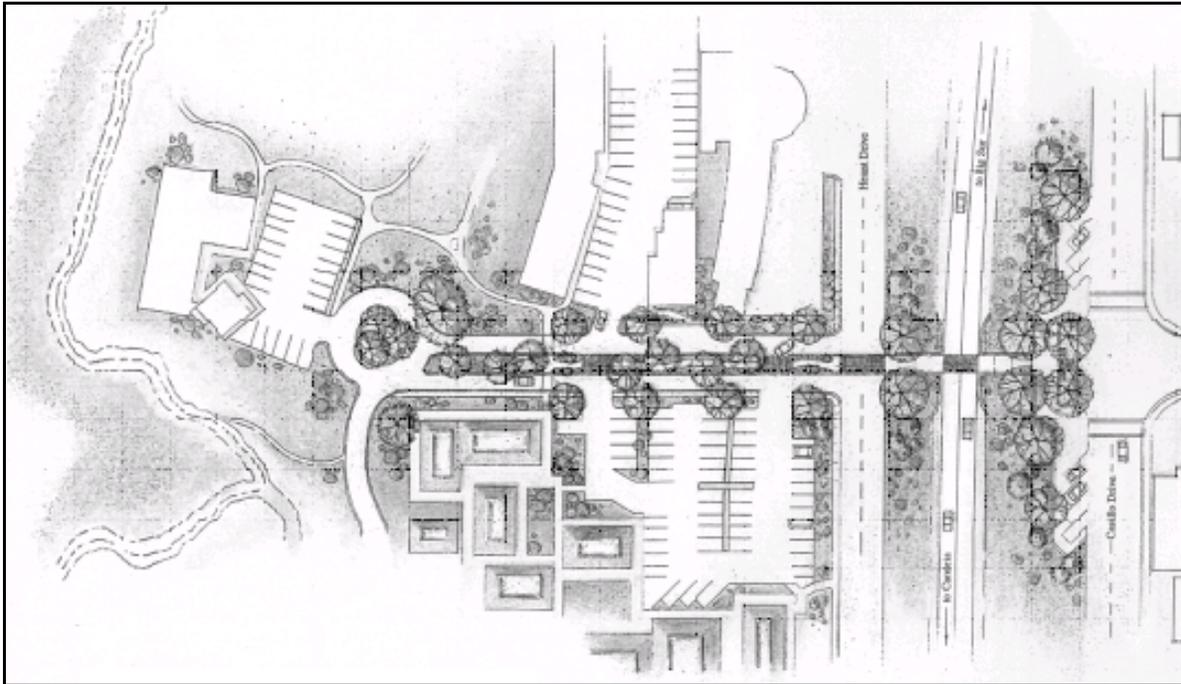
Highway One Crossing Plan, San Simeon Acres
